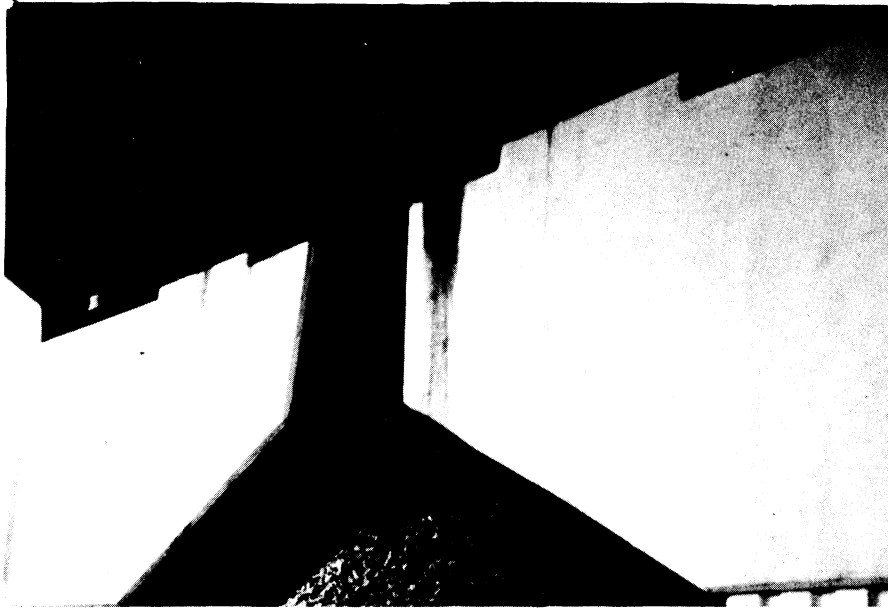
Stained pier cap caused by leakage through the south joint on the Route 195 connection "NN" bridge.
